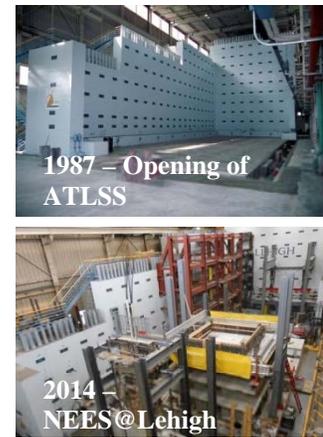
3-D Multi-Directional Reaction Wall and Strong Floor
